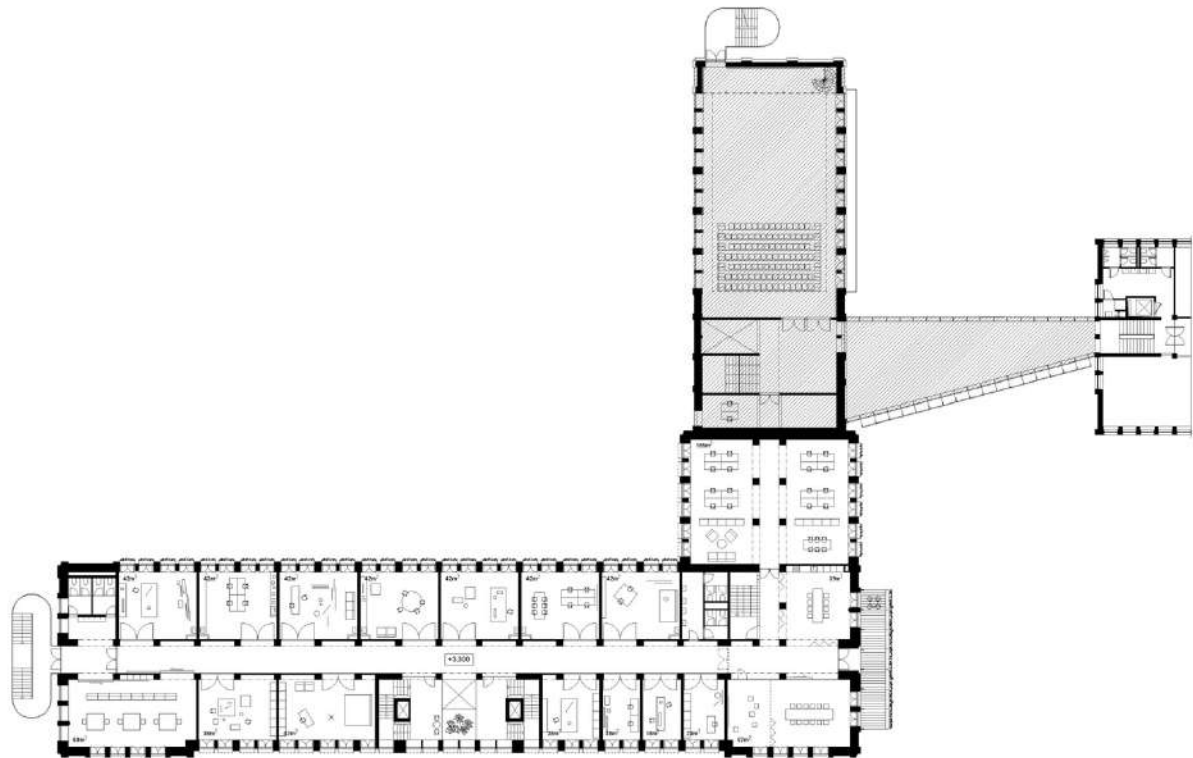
Floor plan level 3 - mixed living and working. Authors: PLURAL
